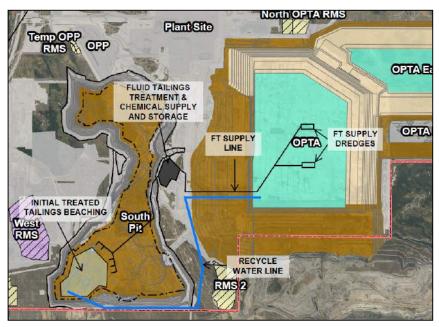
CONCEPTUAL DDA DEPOSITION PLAN
